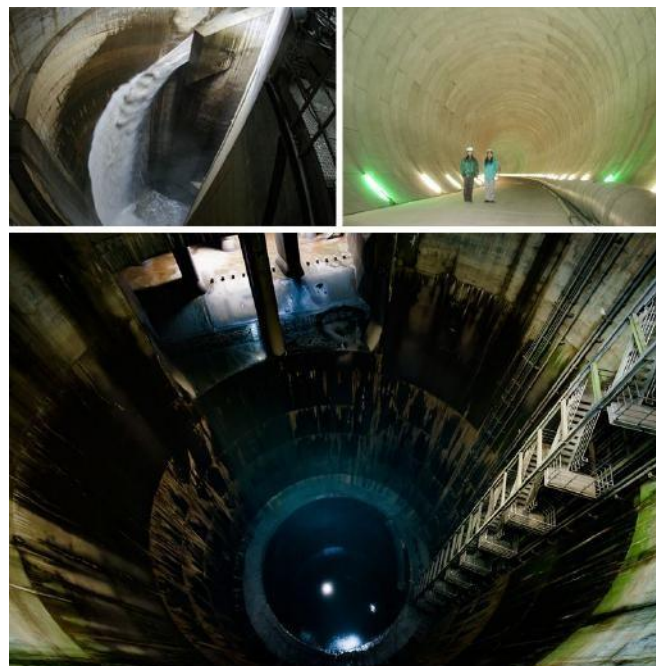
Water flowing into a containment silo. Upper right: Inside the huge, 10-meter diameter underground tunnel. Bottom: Looking down into silo No. 1, which could easily house the space shuttle.
